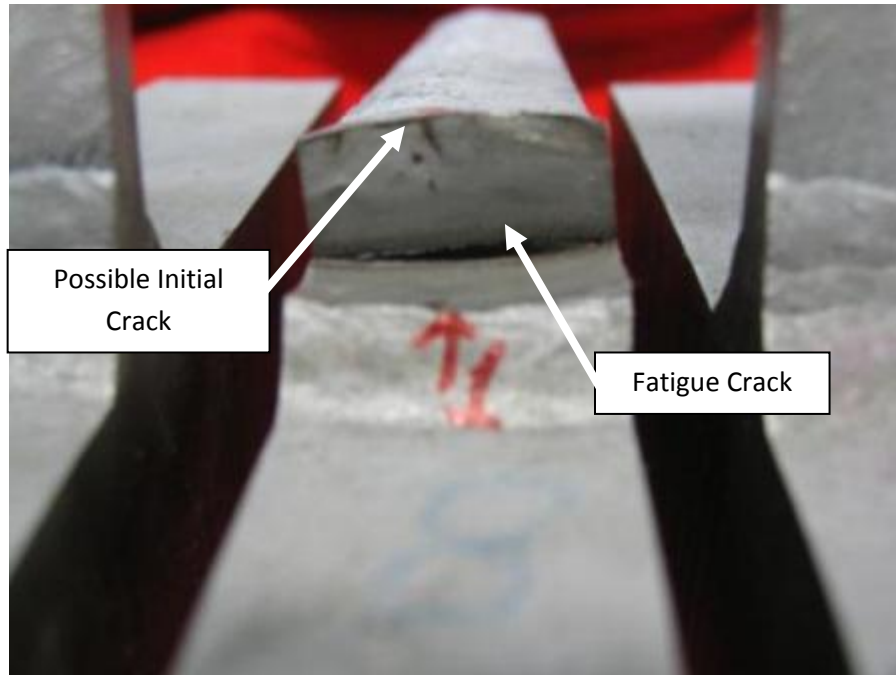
Bend 8 of Specimen 33-3-12-TX-VG-A with Fatigue Failure through Weld
